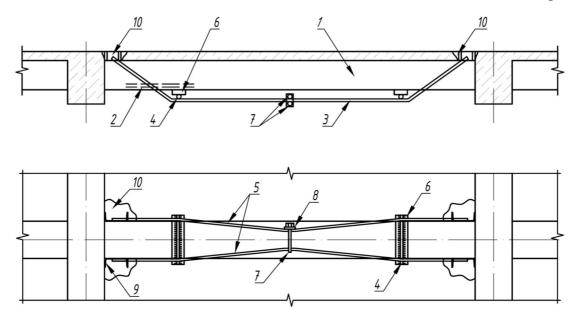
Strengthening of the beam of the monolithic reinforced concrete floor slab with the trussing rod
